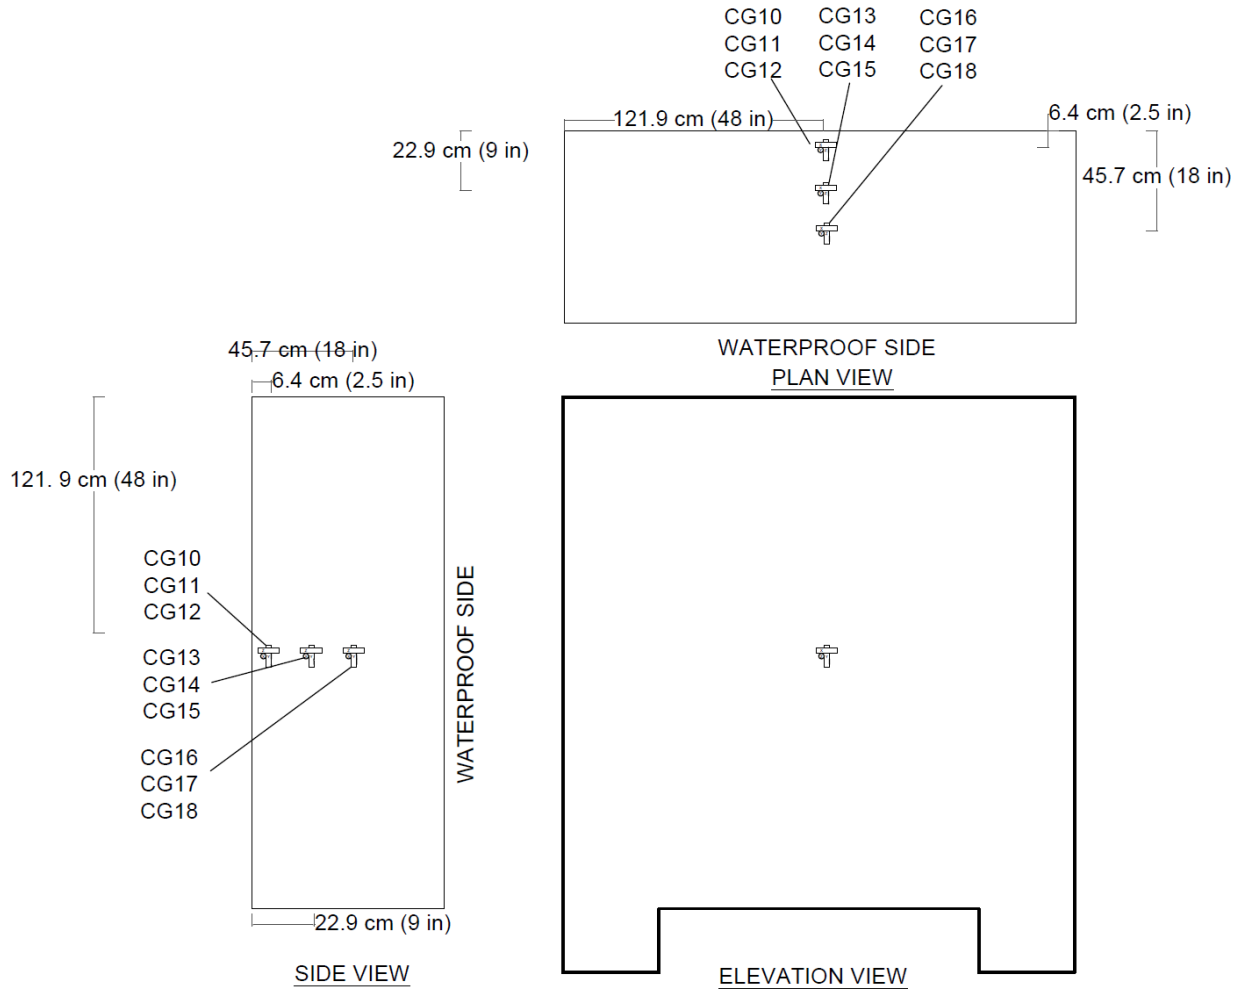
Specimen 2- Concrete Gage Labels and Locations
